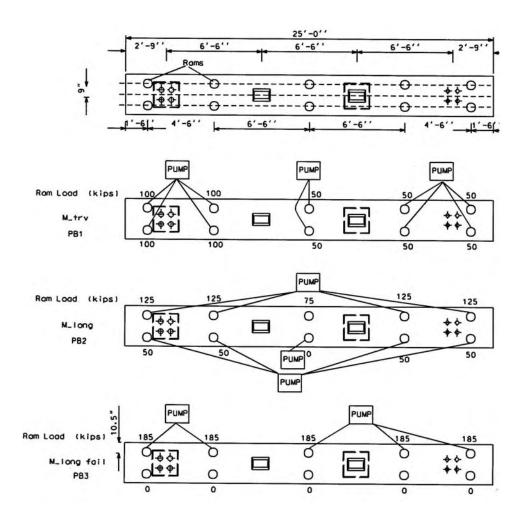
Ram Configuration and Load Level—Trestle Pile Bent
